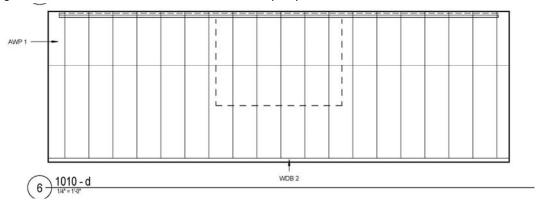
Auditorium Interior Elevation – East Wall (NTS)
